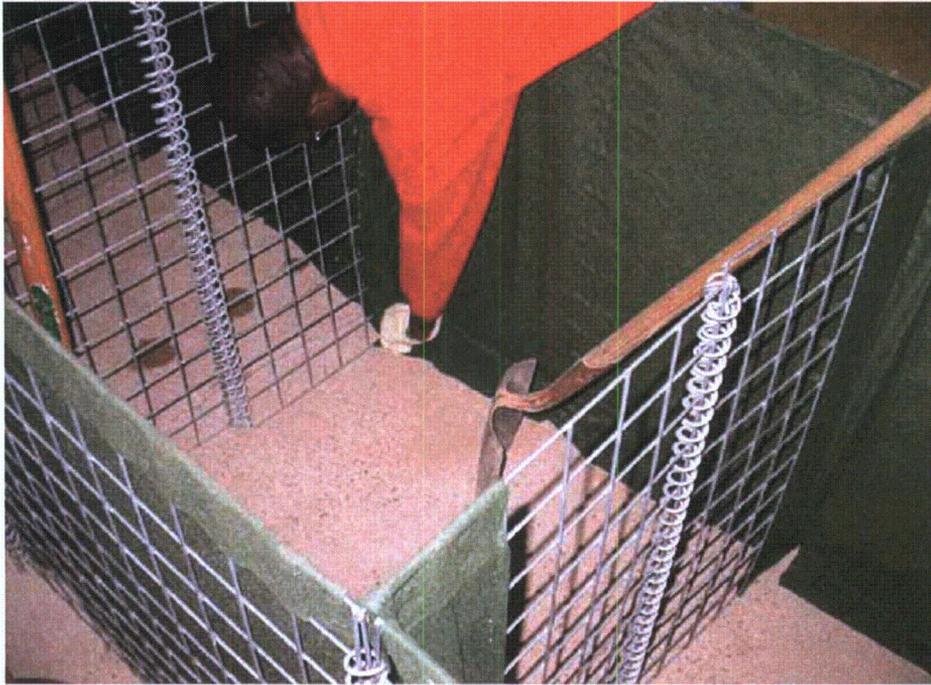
Securing flaps against concrete floor. Note center coils which are prefastened at factory
